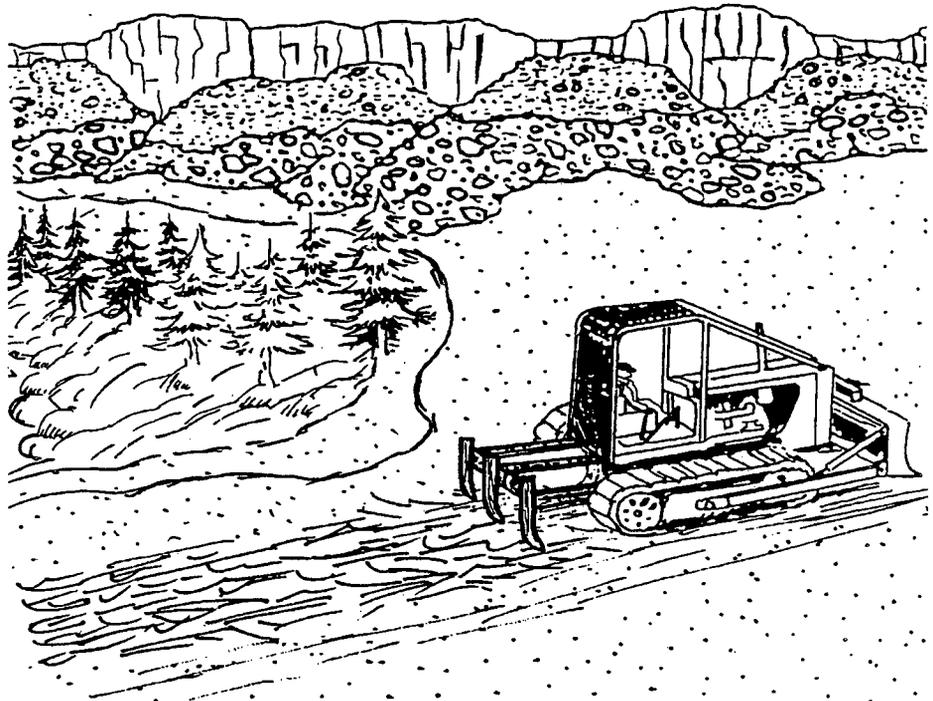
Ripping or de-compaction of pit floors is typically accomplished with rippers mounted on heavy equipment.
